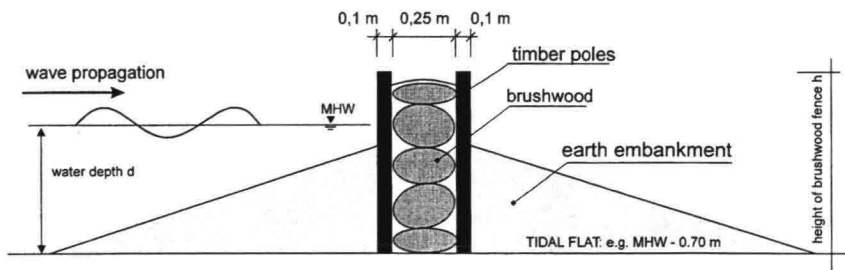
Traditional Brushwood Fence ("Lahnung") with Earth Embankment
